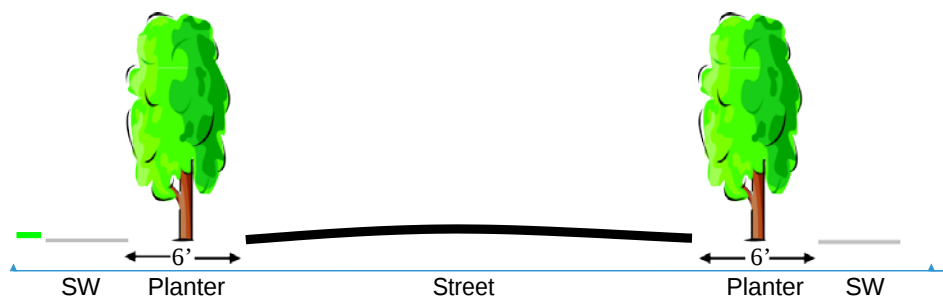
If space does not allow for 8' wide planter strips, then 6' can still be planted with medium to large street trees, however potential for root damage is higher.
